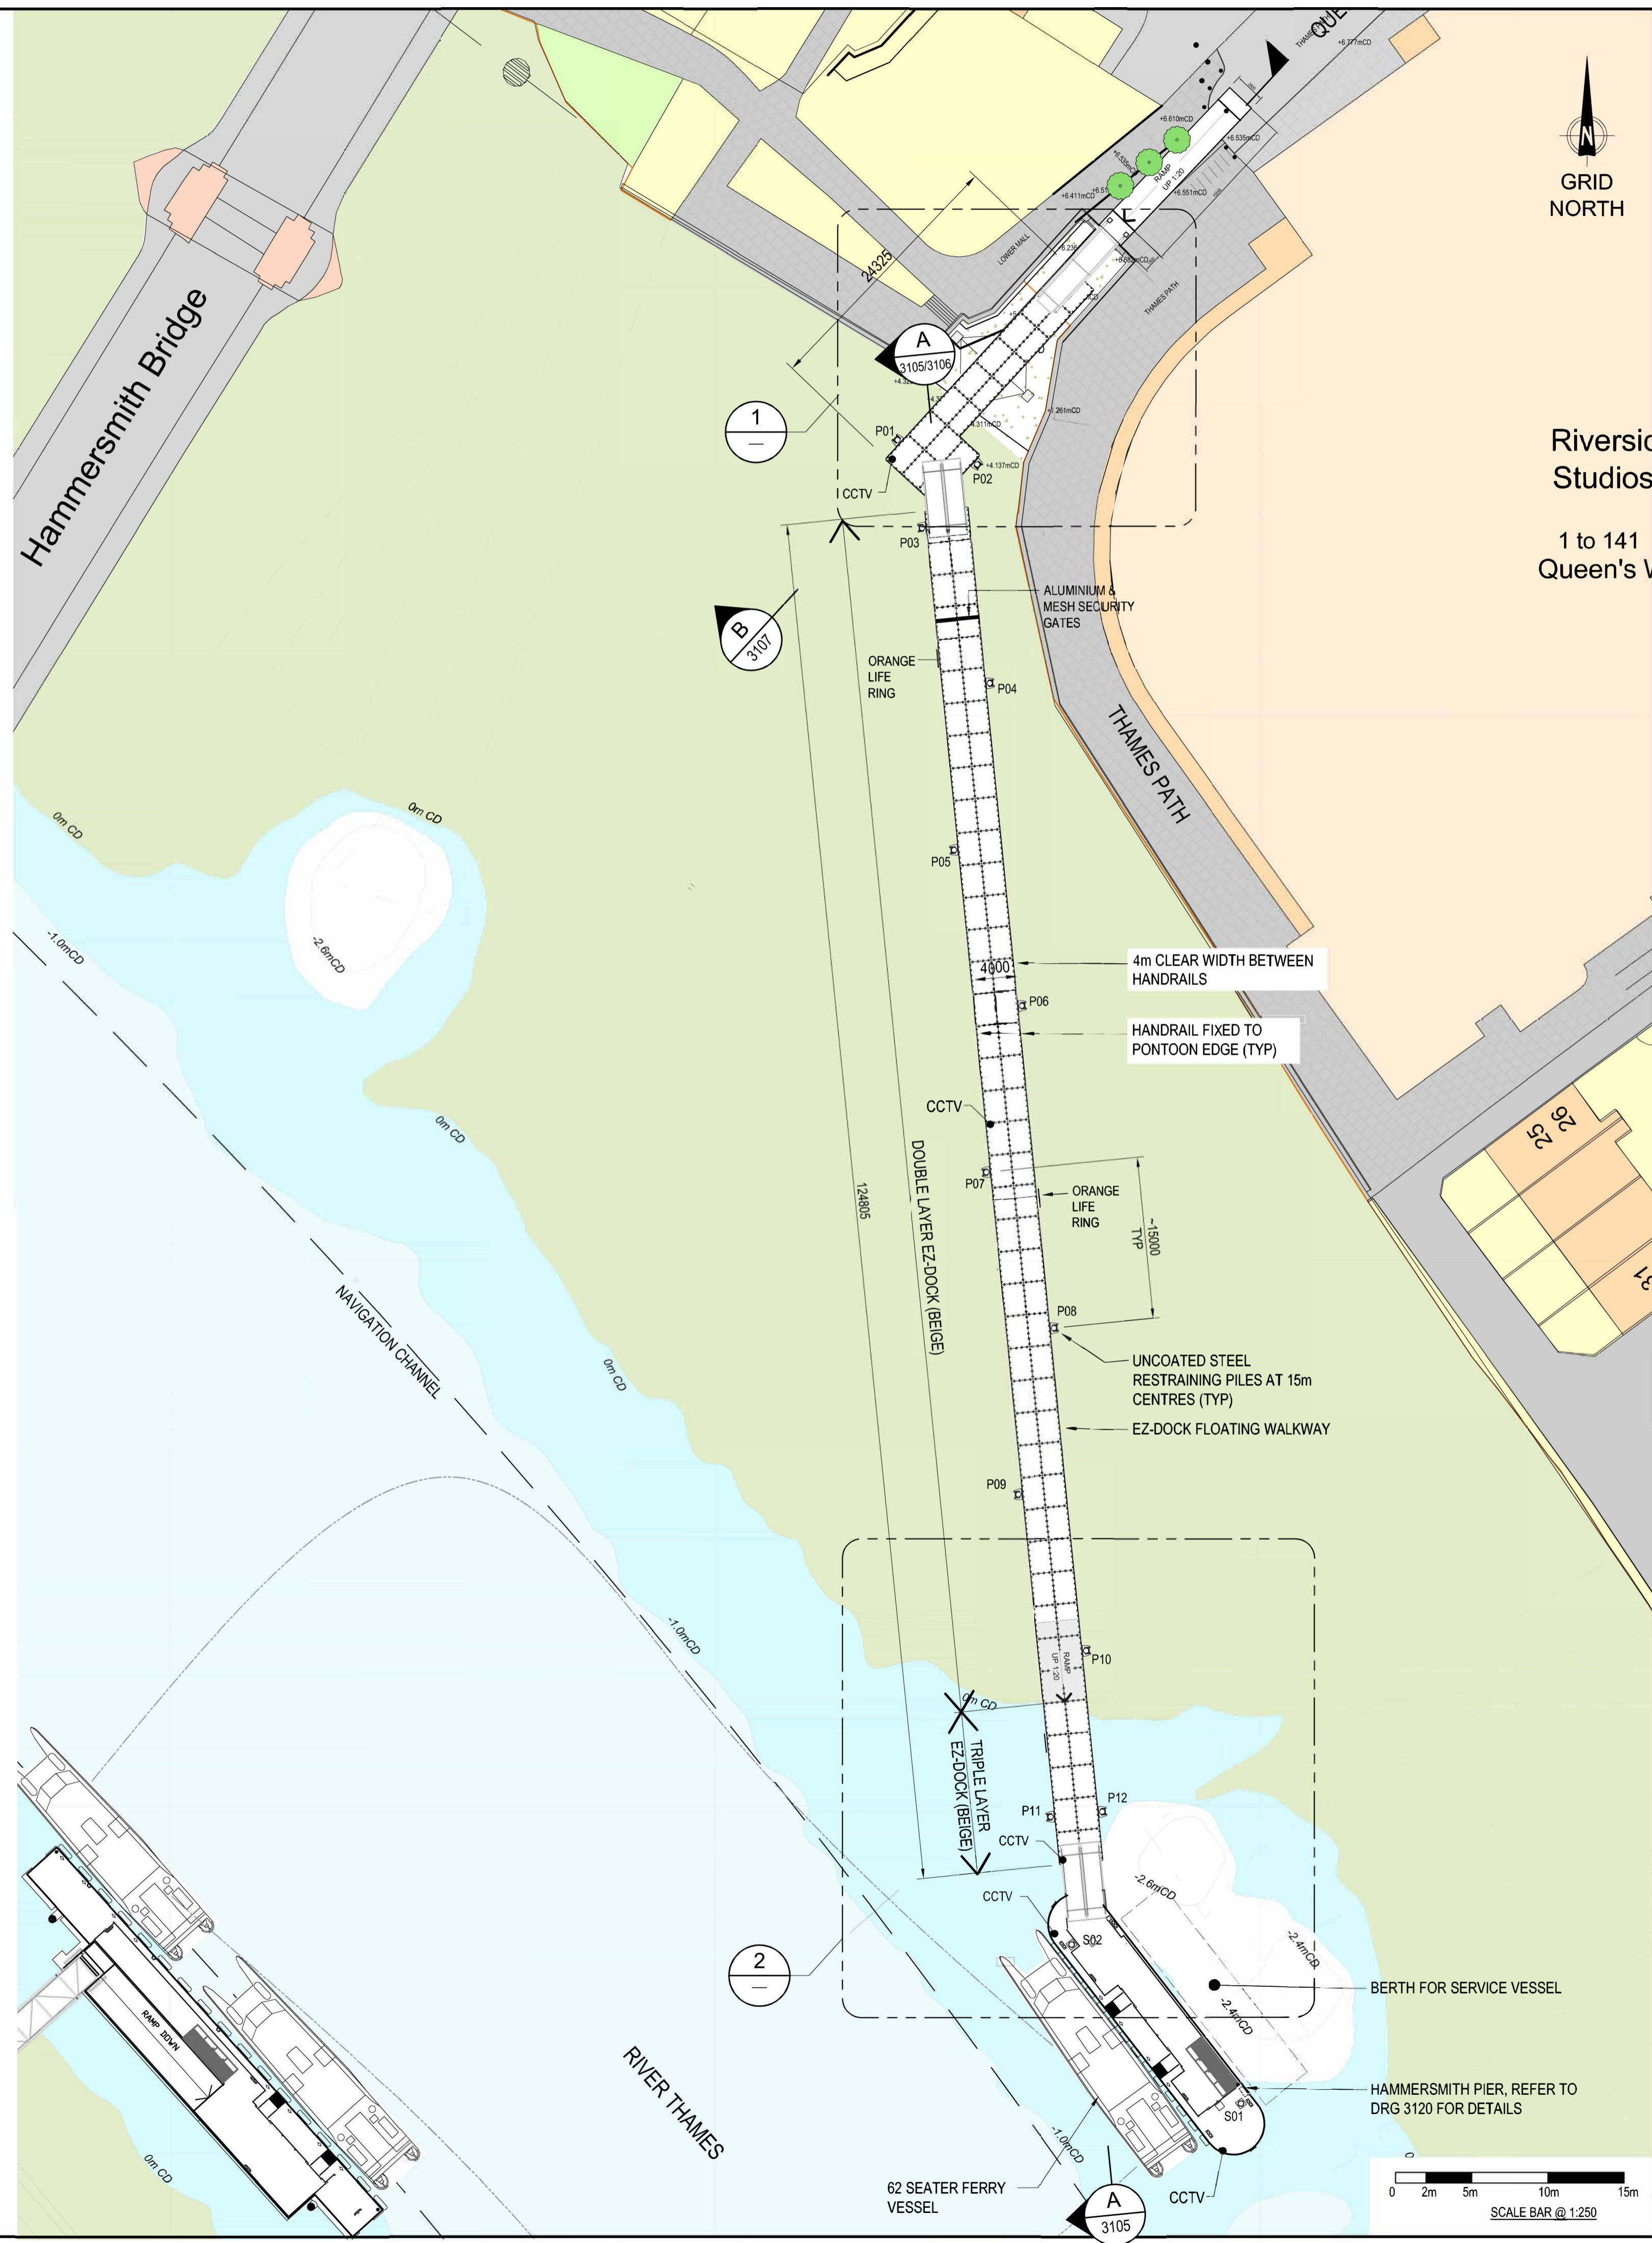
PROPOSED HAMMERSMITH PIER - PLAN
